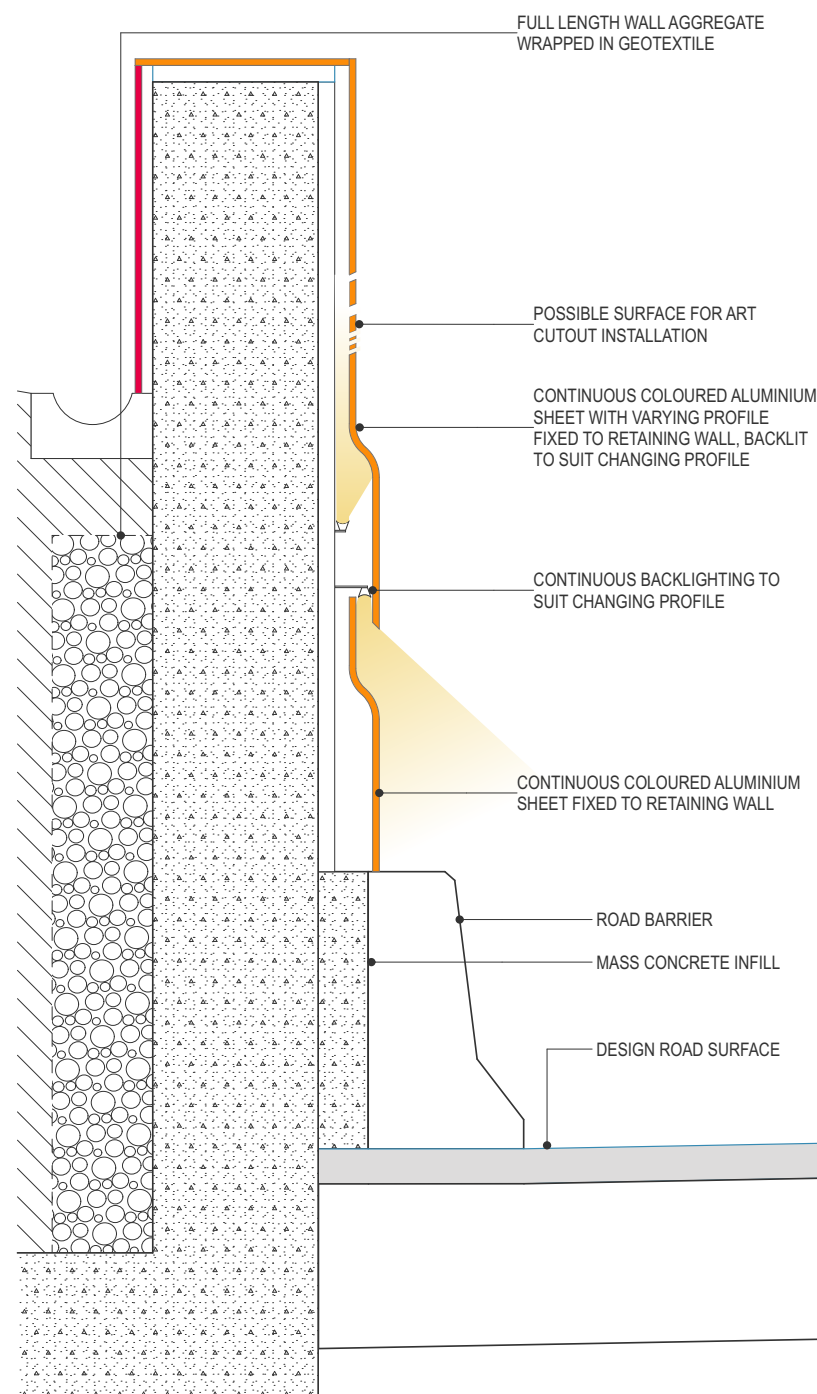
An example of a wall cladding integrating colour, texture and lighting. A similar treatment would be able to be applied to traffic safety barriers and other vertical elements to tie together the 'Gateway'
